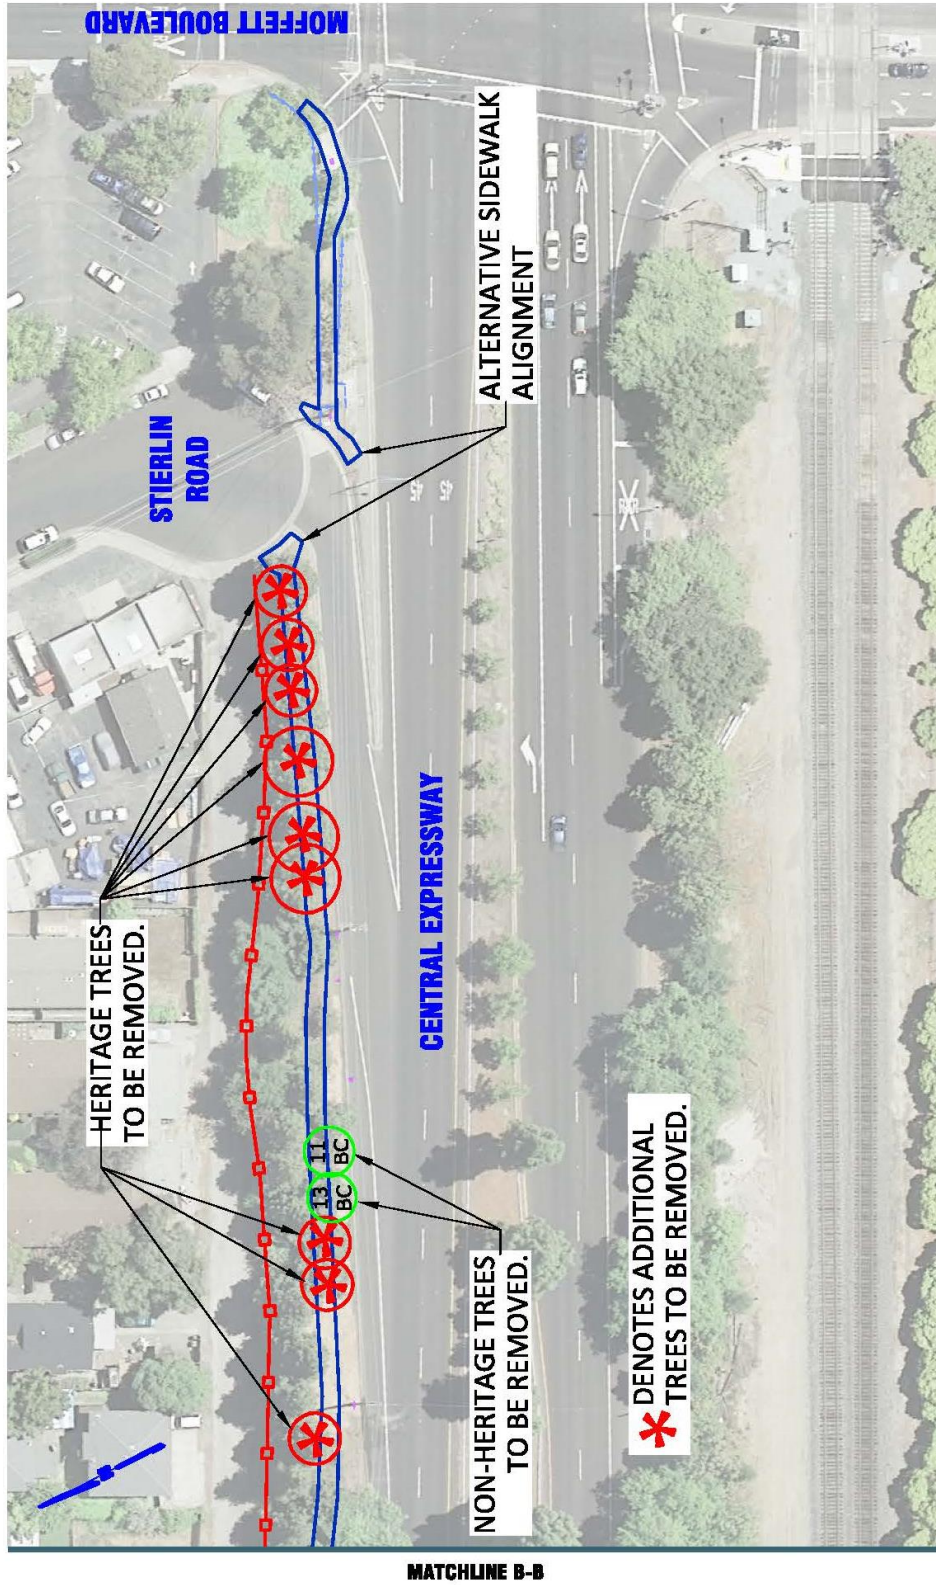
Exhibit L – Alternative Sidewalk Alignment and Tree Removal Locations
